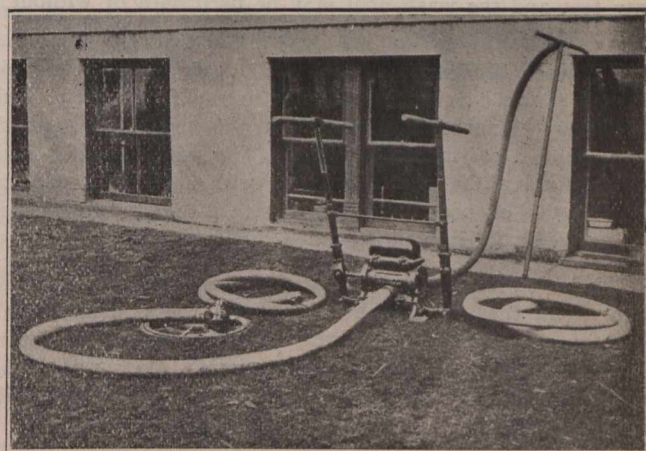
Wash-Drill Outfit for Testing Foundations.
